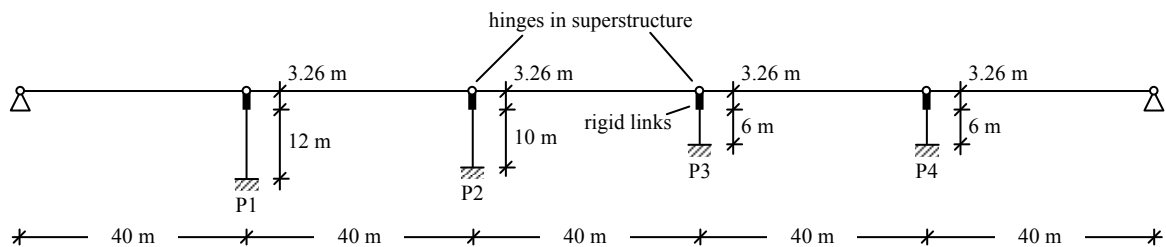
Dynamic system of bridge with simply supported girders as superstructure [Bim06]
